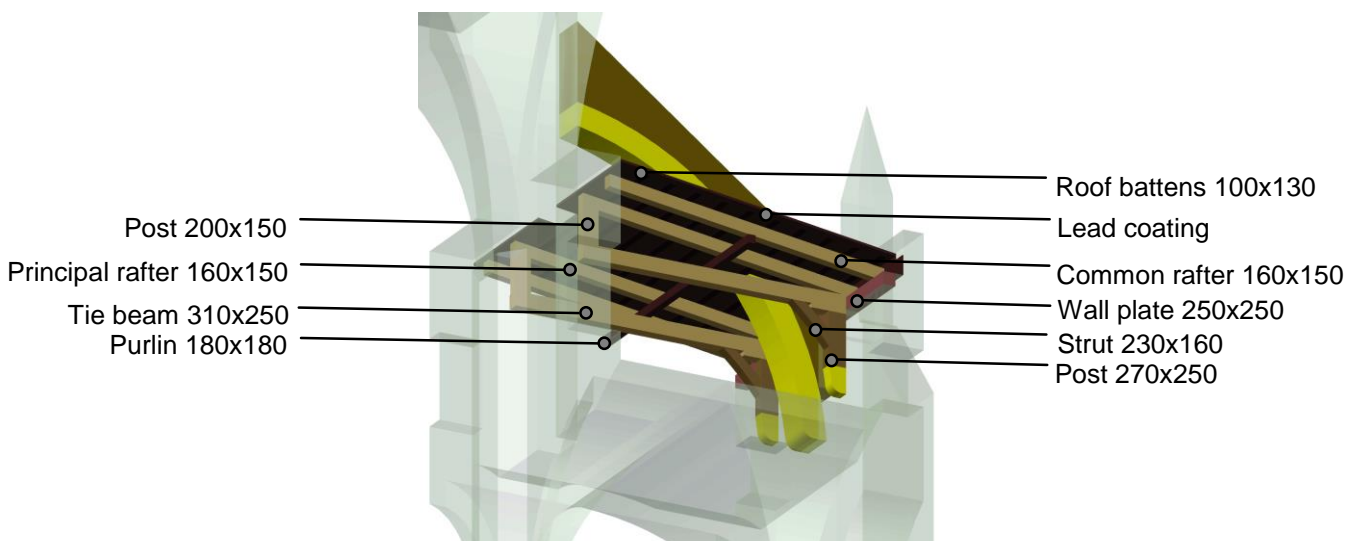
Structural parts of the roof framing in the south aisle of Canterbury Cathedral and section areas (millimeters).
